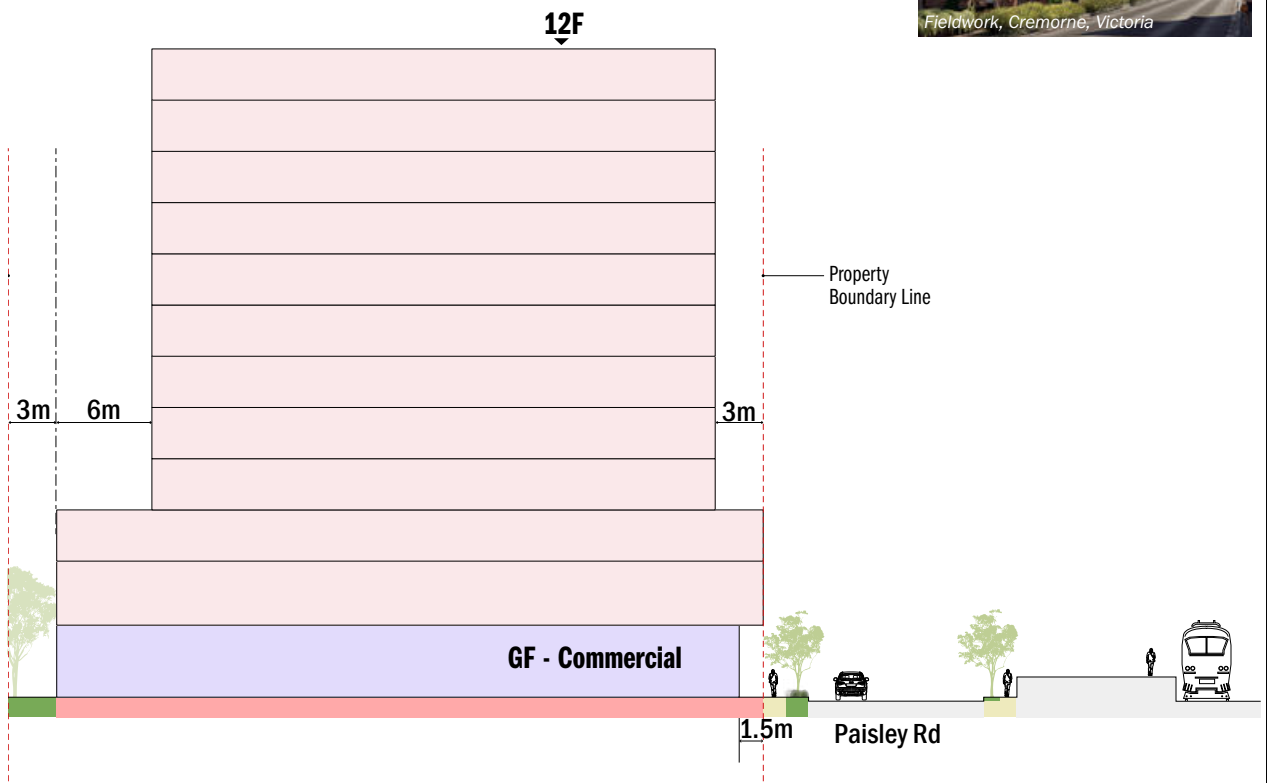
Section 1 - Paisley Street from Edwin Street corner
